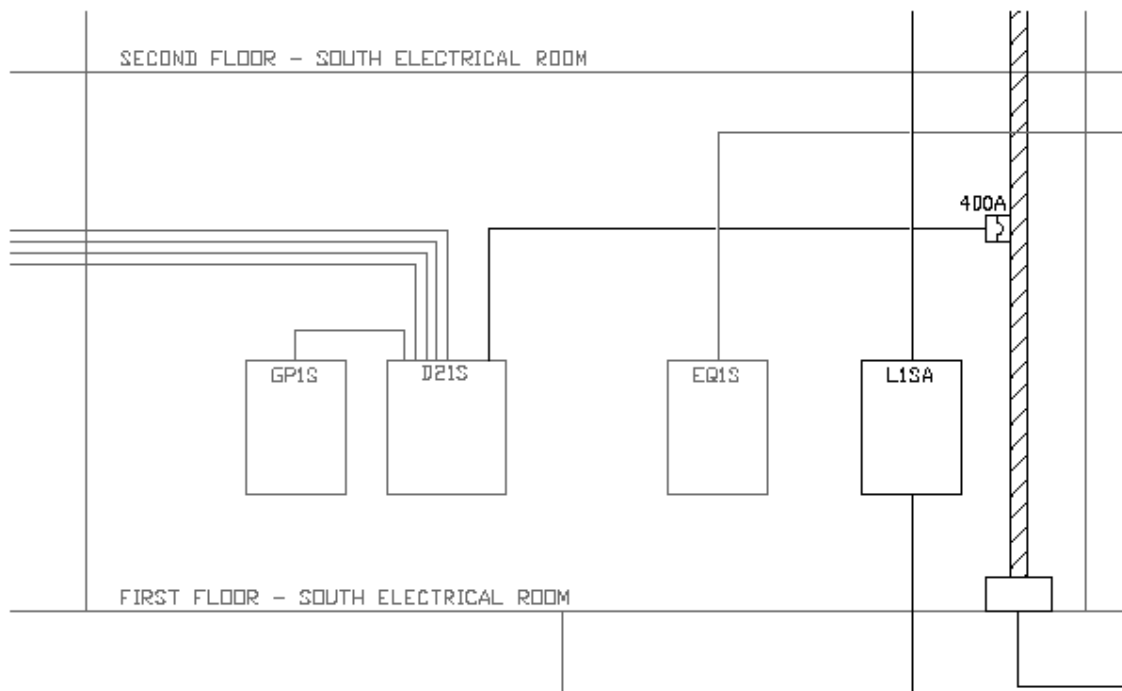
Riser Diagram of South Electrical Room – Proposed System
